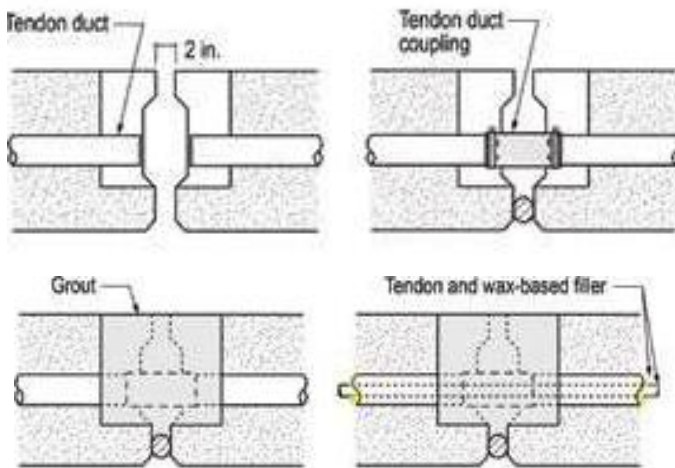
The keyways and tendon ducts were designed to prevent leakage or blockage: (a) block-outs provided access to the tendon ducts; (b) a backer rod was installed over the length of the keyway and the tendon ducts in adjacent panels were coupled; (c) keyways were grouted after Panels C and D were installed; and (d) after all panels were in place, the tendons were installed, tensioned (starting from the center of the group), and protected with a wax-based filler (Note: 1 in. = 25 mm).
